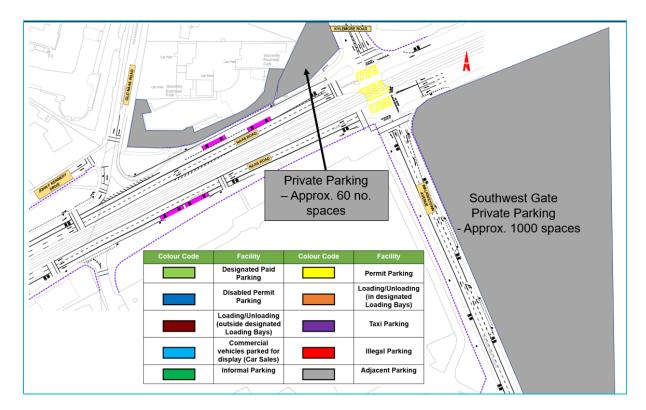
Naas Road between Robinhood Road and Walkinstown Avenue Parking Facilities
